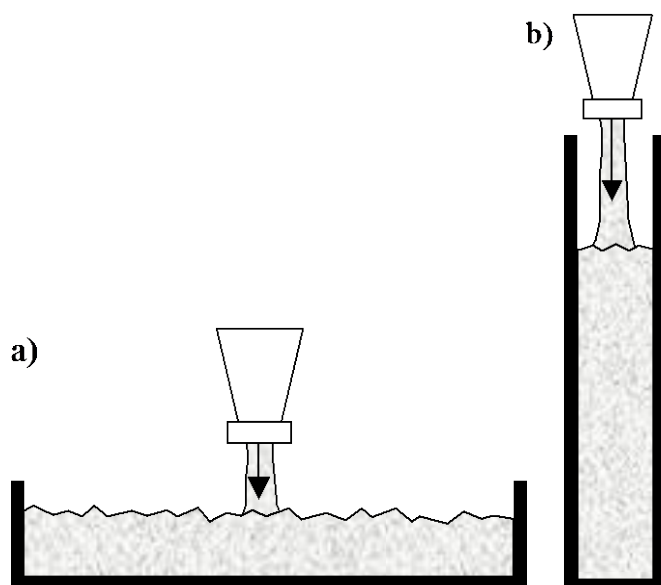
Specimens cast in the correct position; a) beam or column; b) column only
